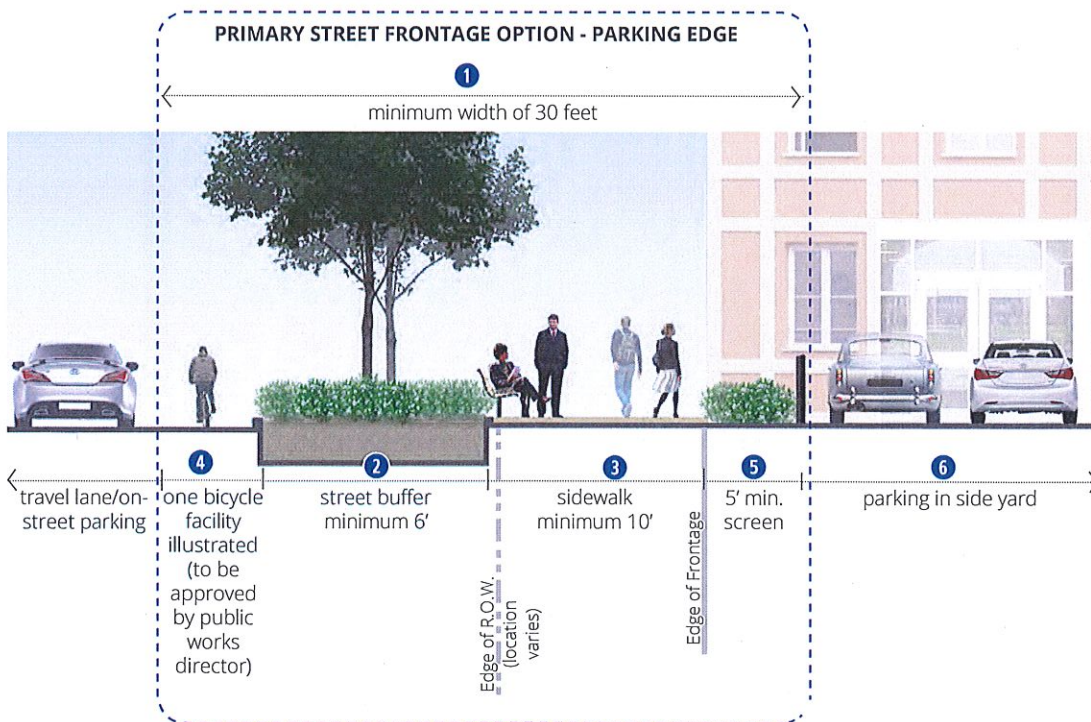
Primary Street Frontage Option - Parking Edge
